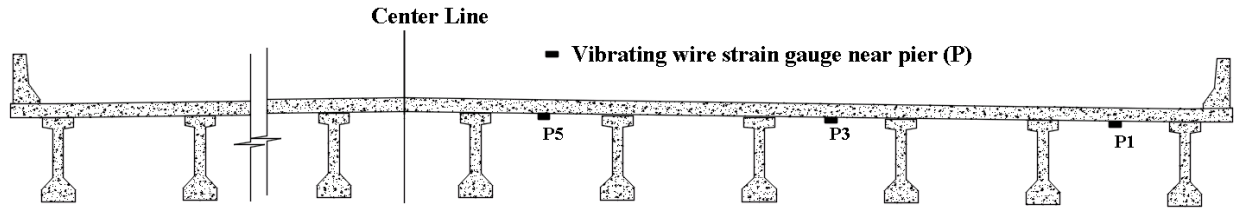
Instrumentation layout in pier section for long-term testing (first span)
